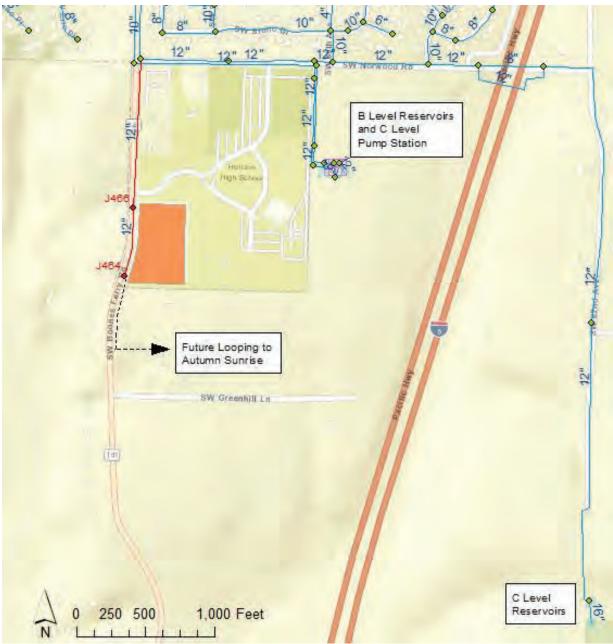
Proposed Development Site and Existing Water System Infrastructure
